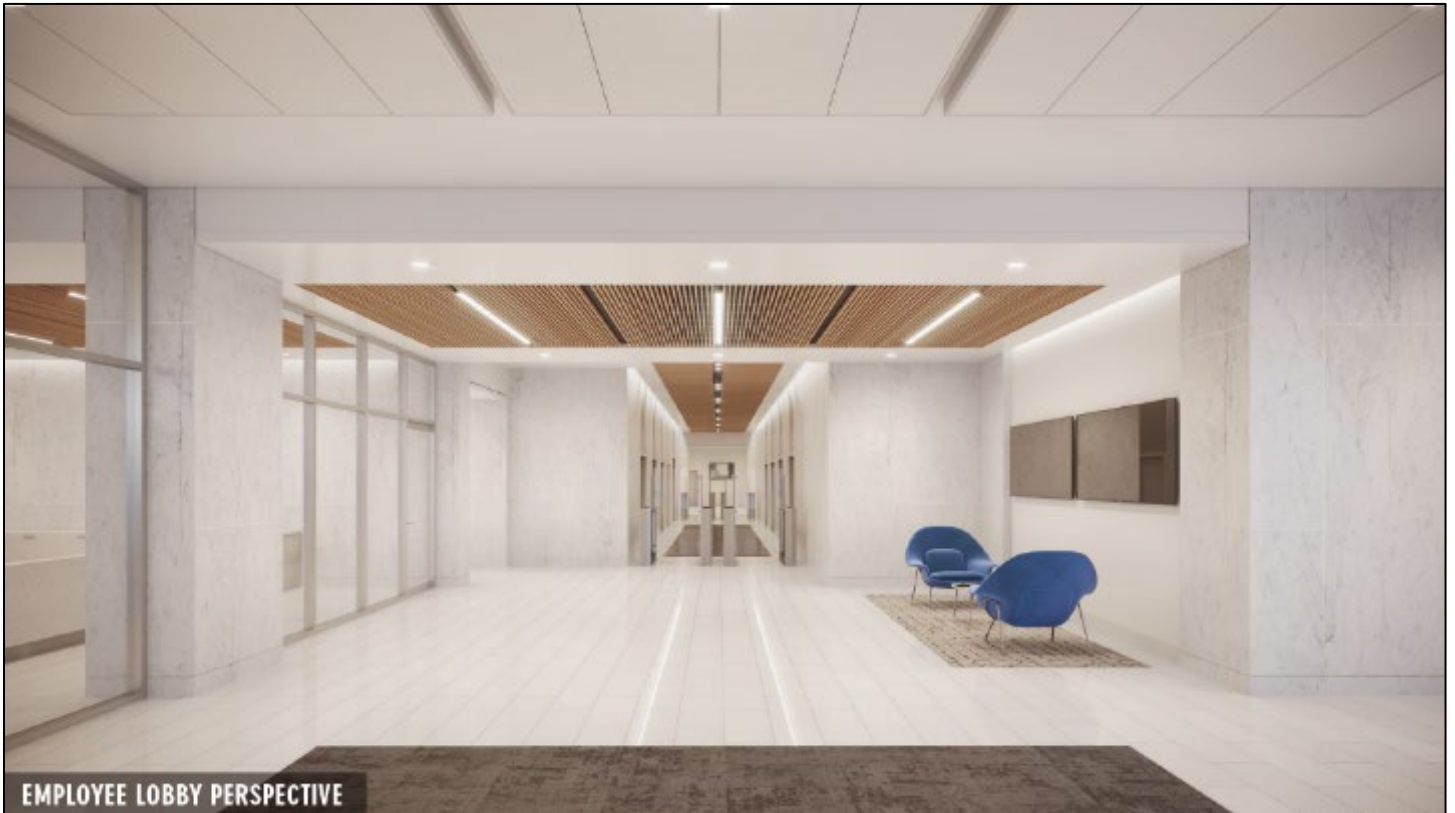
Overview of the proposed lobby design for the West Tower from the employee entrance toward the open elevator lobby, facing west.
